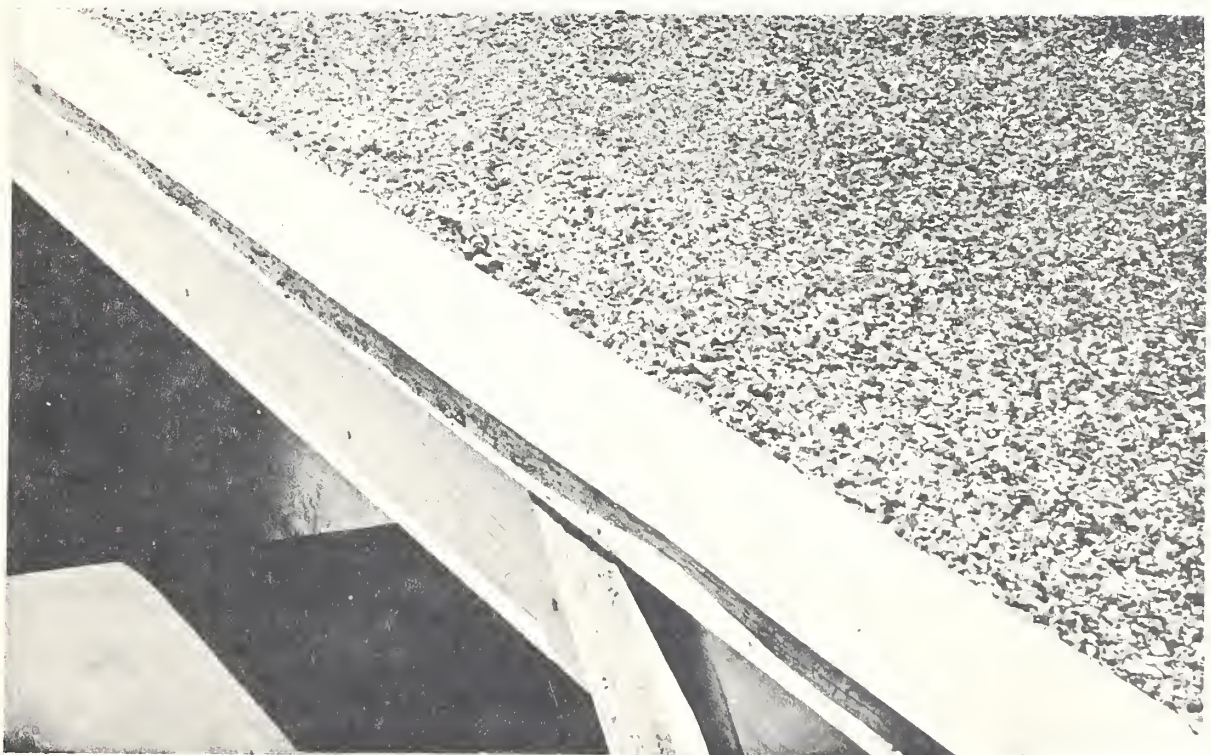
After. Section of roof shown in Figure 48 after repair and installation of metal gravel stop.
